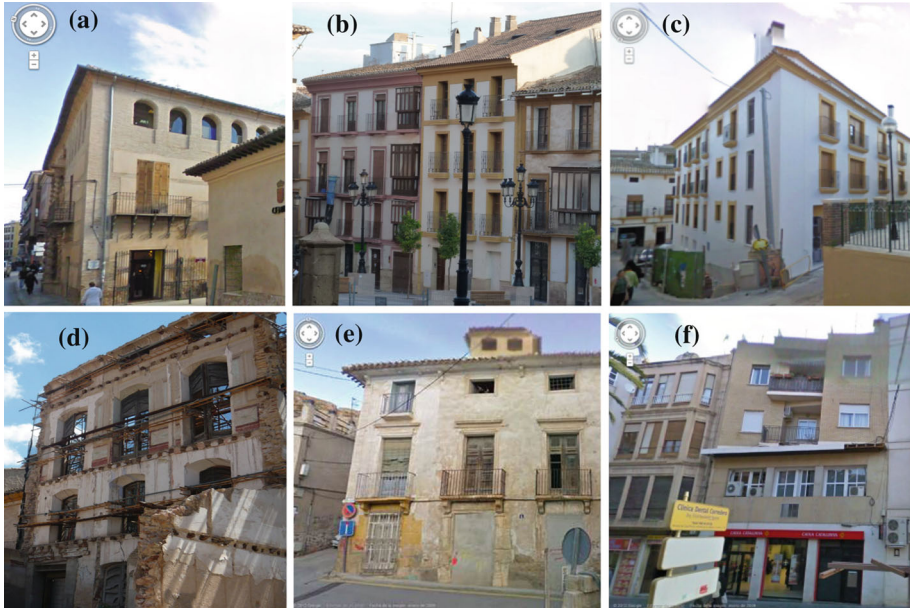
Buildings in the surveyed area, before the earthquake: a fullrestored mansions with residential or administrative use, b traditional residential buildings, c new apartment dwellings, d cleaned up buildings, e abandoned buildings and f new reinforced concrete buildings (Google Street View)
